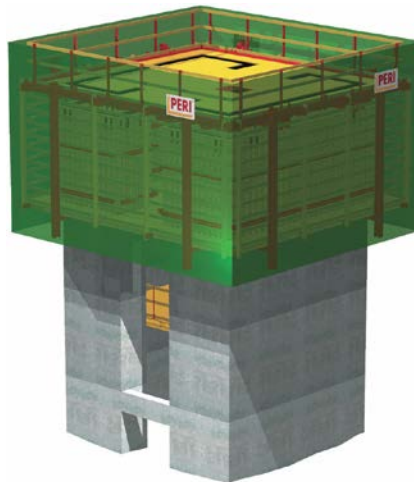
Outline of ACS P: The solution for advancing cores of high-rise buildings and tower-like structures. The platforms provide generous storage and working areas. With the ACS P system, only a few platform beams cross the walls. This means that the reinforcement can be partially prefabricated. (Image: PERI GmbH, Weissenhorn)
